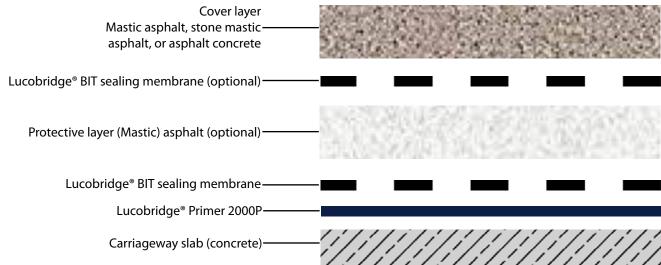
Two-membrane layers (mandatory) Dutch Bridge Design
